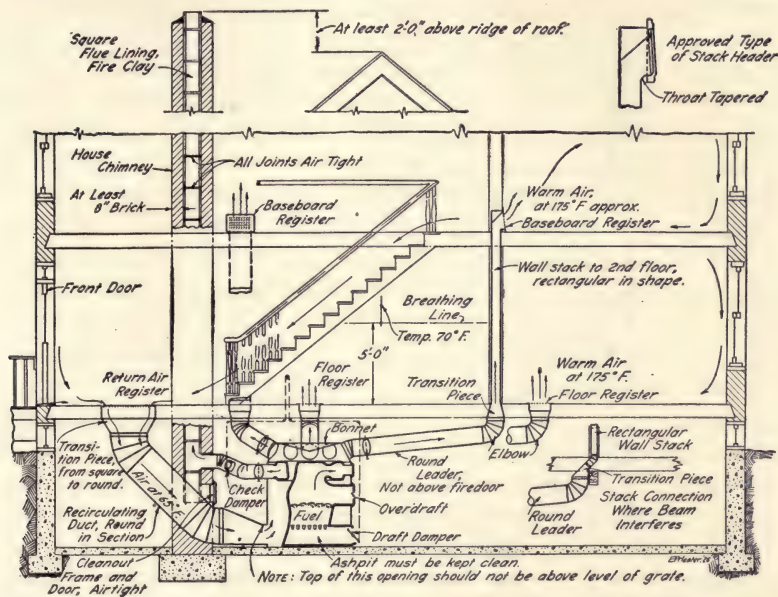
Section of elevation of a house, showing installation details for warm-air heating system. Note location of the return air register and tapered transition fittings to reduce friction of air flow.
